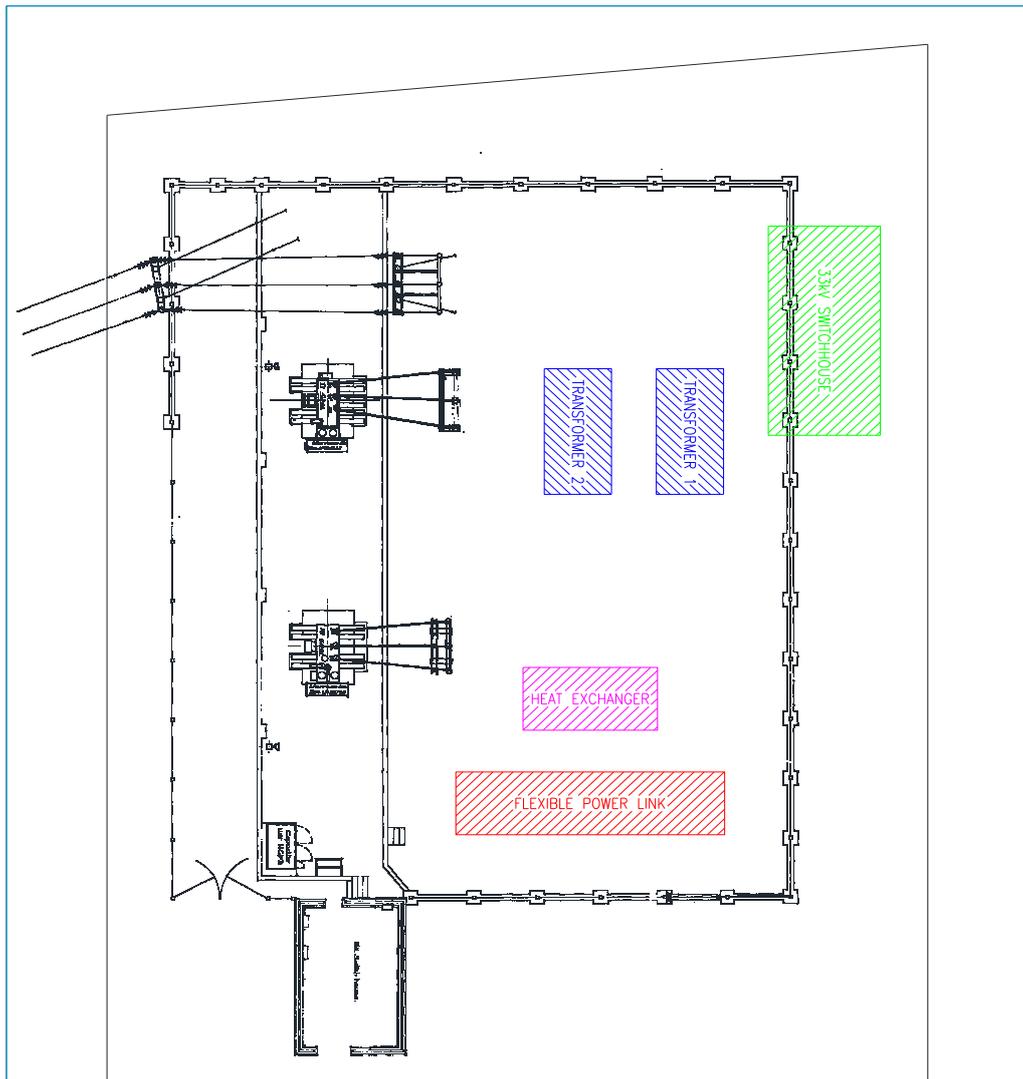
Proposed FPL and 33kV Switchhouse Layout at Exebridge
